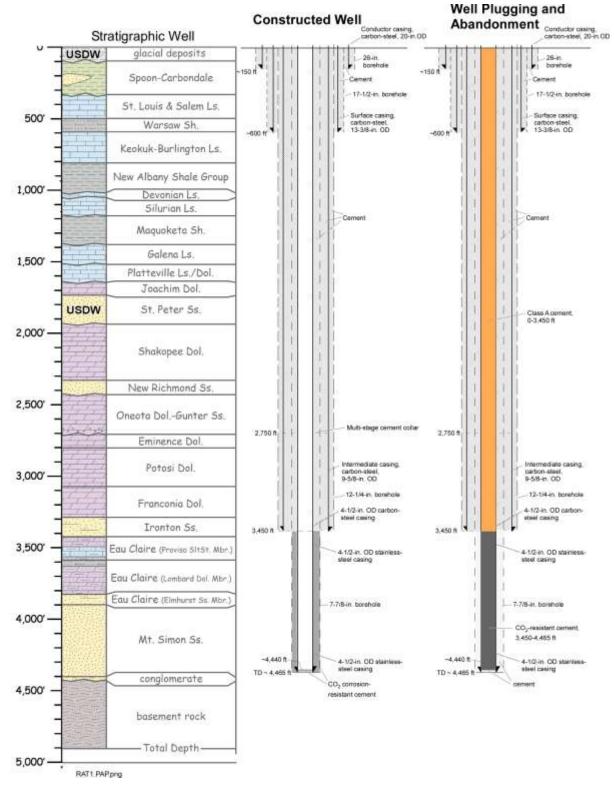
Construction design and plugging and abandonment plan for the reservoir access tube wells.
